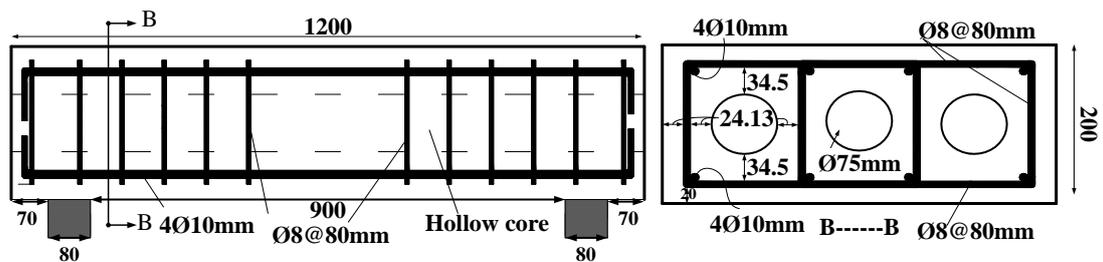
The Details of Section and Side View of HCS Specimen (HCS-200-B) (all dimensions in mm)
